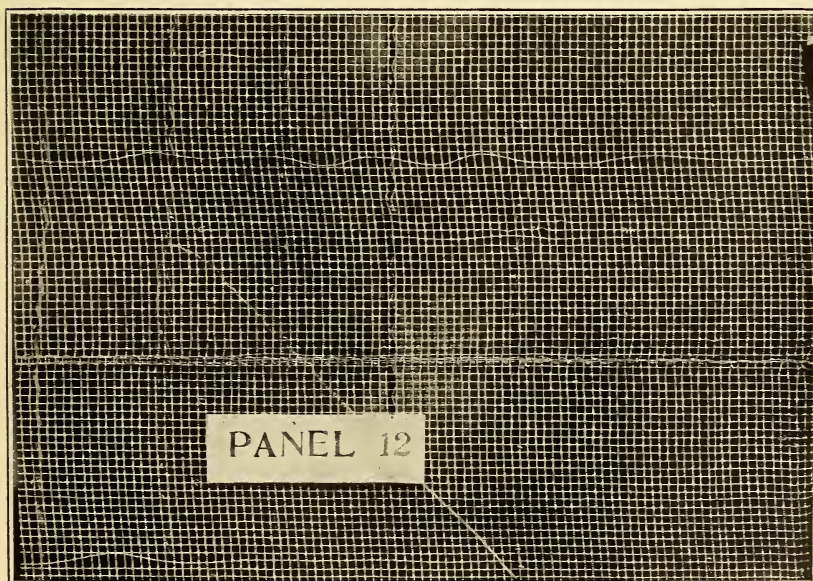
Galvanized woven wire lath on panel No. 12, showing furring 6 inches apart. Same construction on panel No. 9
